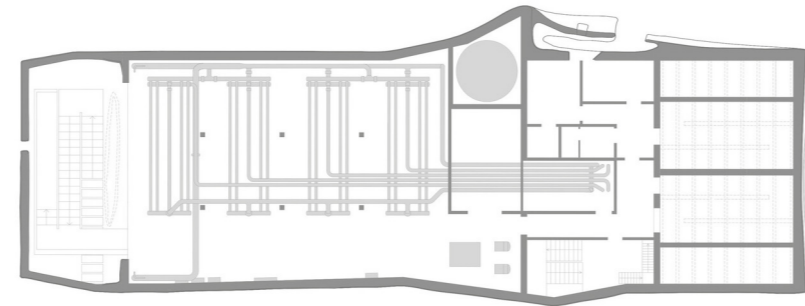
First floor plan showing piping runs and filter room (Müller, 2017)
